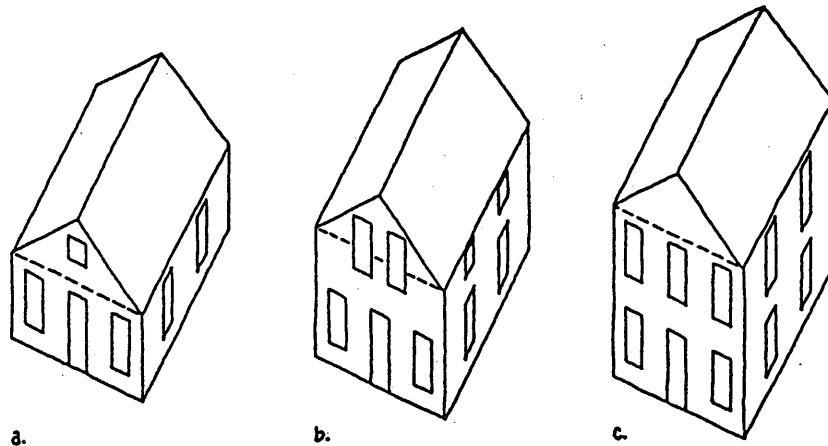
Wall height guidelines illustrated, note the eave line: a) one story, b) one-and-one-half story, c) two story (after Murphy).
